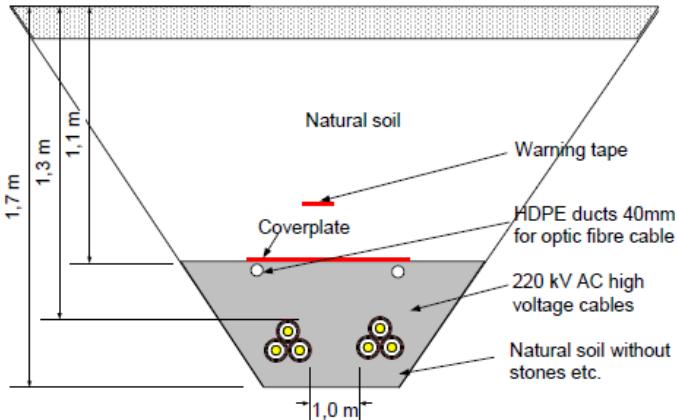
Cross view typical 220 kV cable trench Eemshaven
